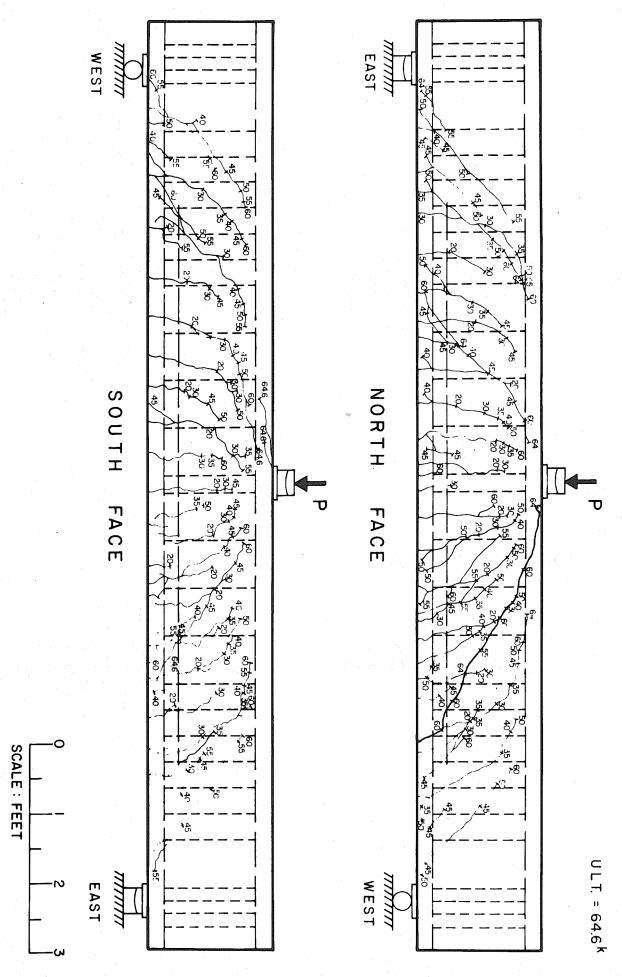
F BEAM I WCRC-I CRACK PATTERN
